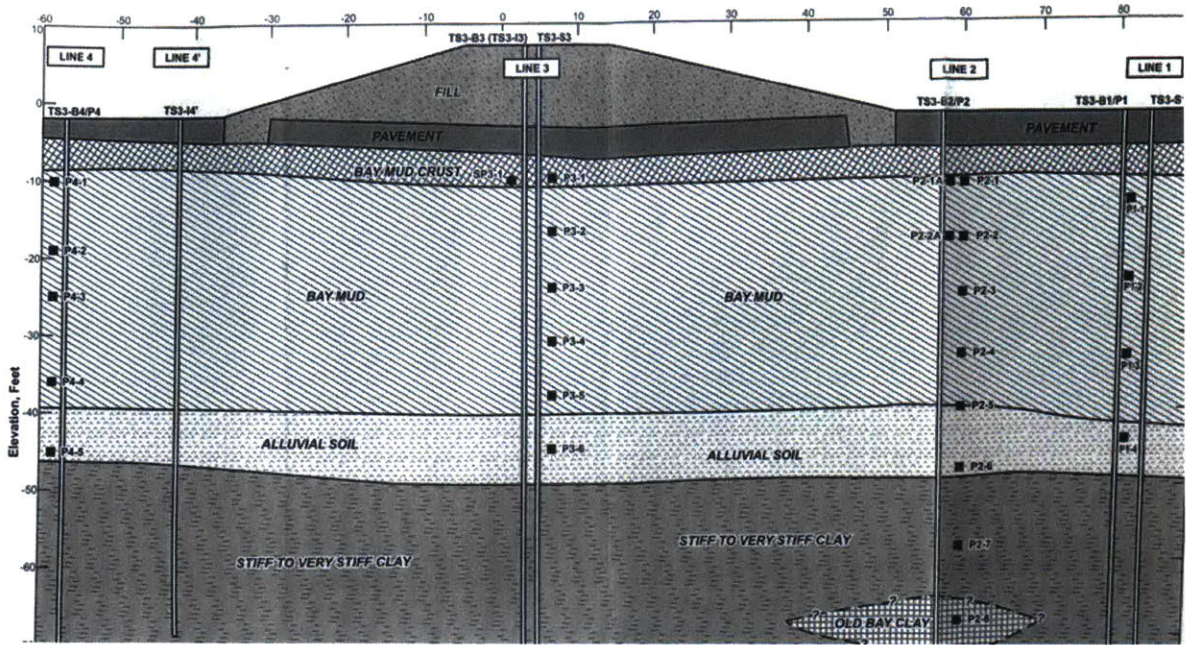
Layout of installed instruments in TS3 (URS, 2003).
